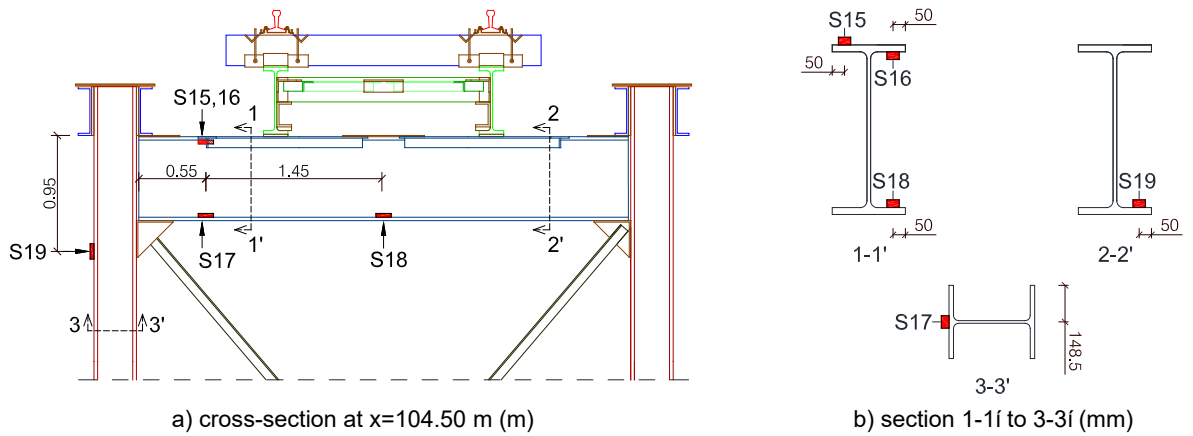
Position of the strain gauges installed on the cross-sections close to column P3 ($x=104.50$ m).
